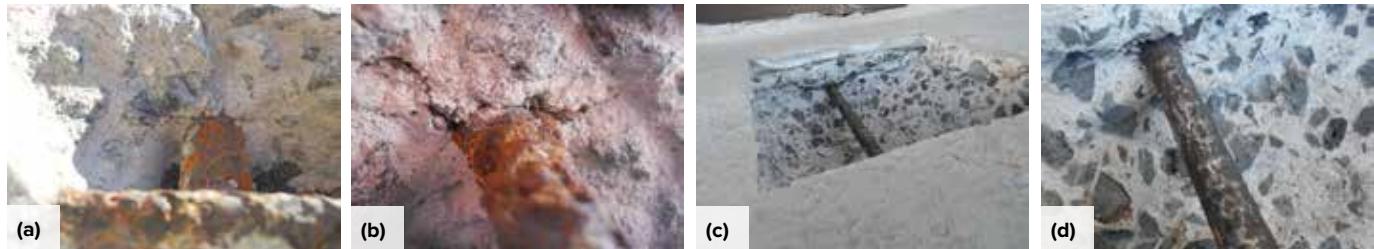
Examples of corrosion that has induced defective bond, cracking, and delamination in the concrete (a-c); and (d) a close-up of (c) showing pitting corrosion on the bar after corrosion products were partially removed
